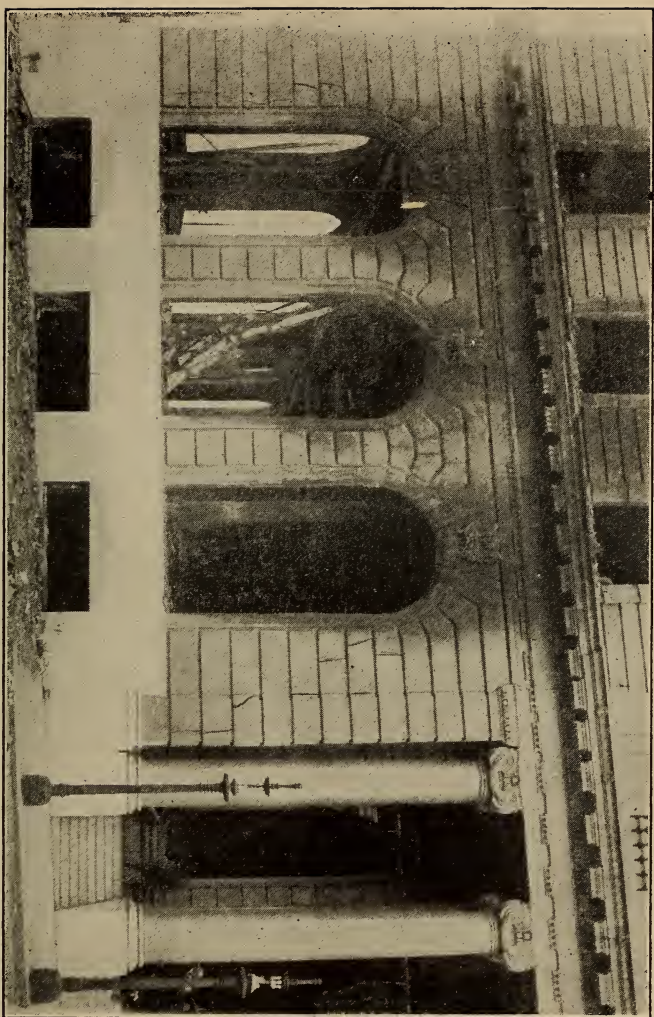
St. Francis Hotel, Southeast Corner, Showing Heavy Earthquake Cracks in the First Story of the Sandstone Front.
